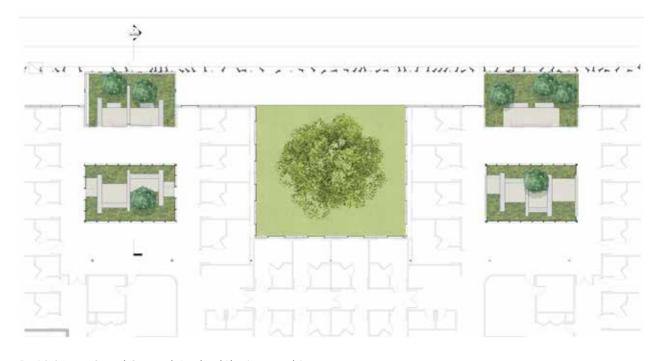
Lower Ground Courtyards Rendered Plan (not to scale)
